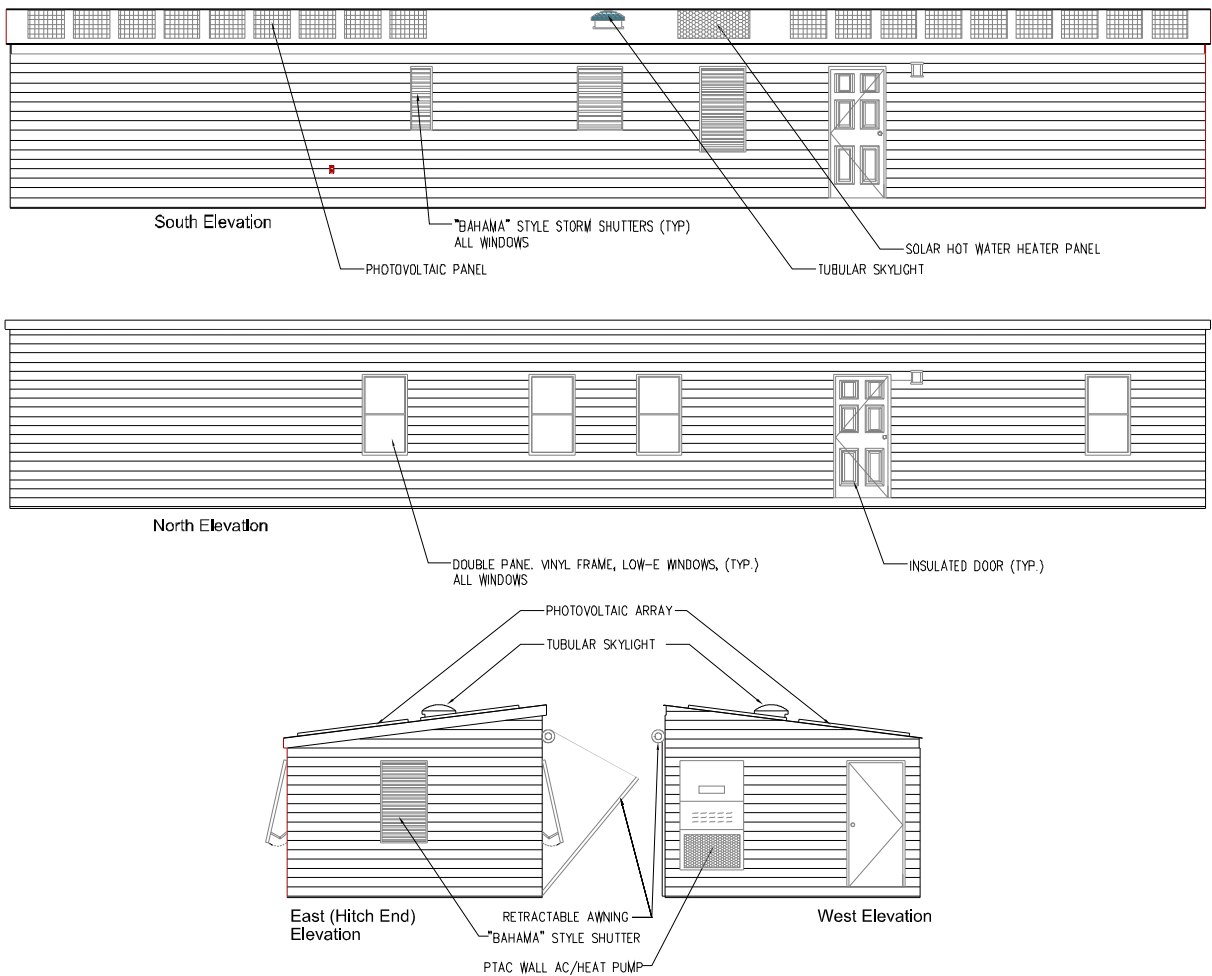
Elevations for the Building America Structurally Insulated Panel Manufactured Home
